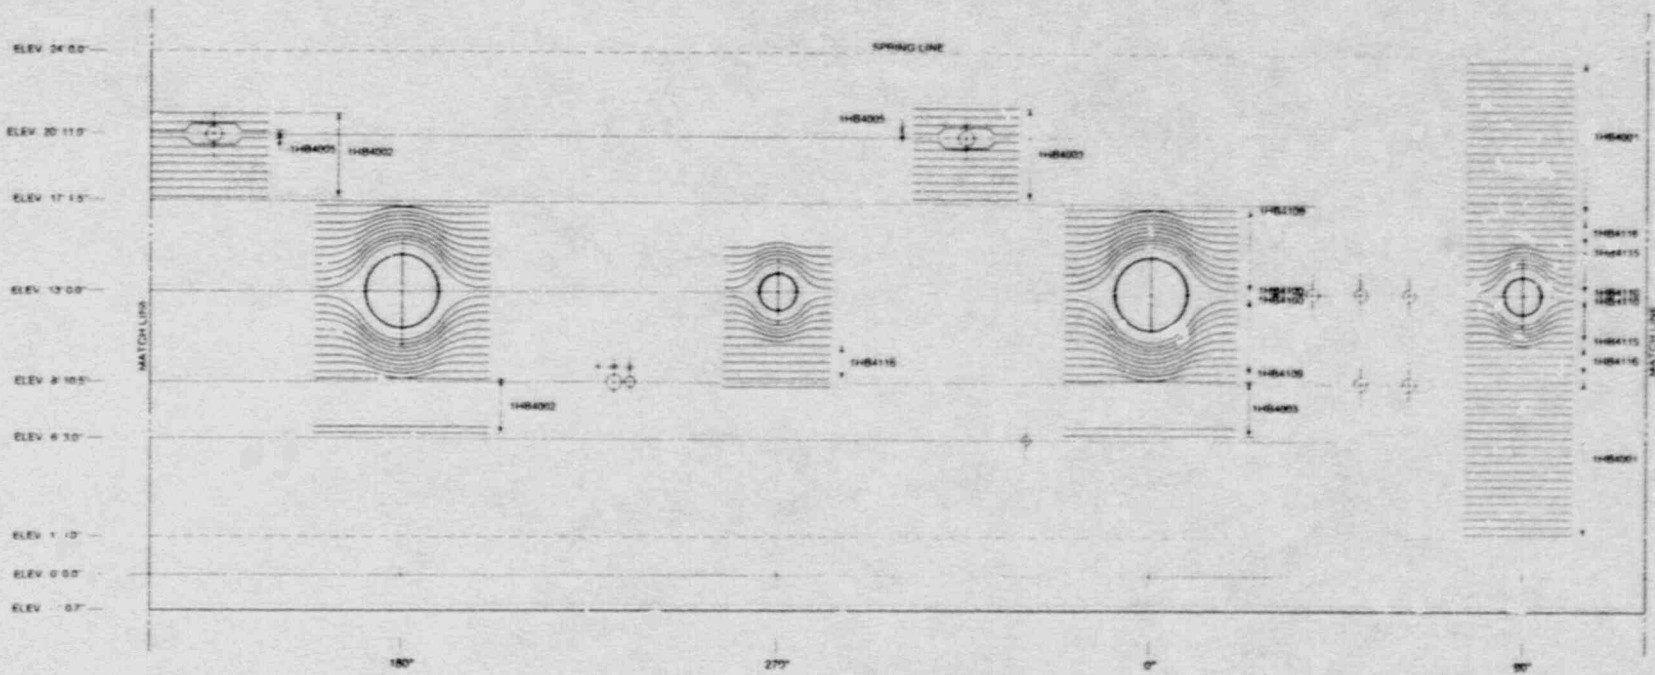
Cylinder Stretchout - Reinforcement Layers 1 and 3
